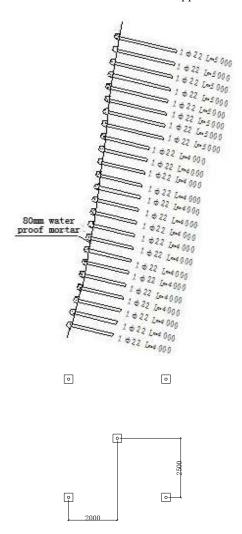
The side view of the bolts layout and the detailed layout of the bolts (unit: mm)
